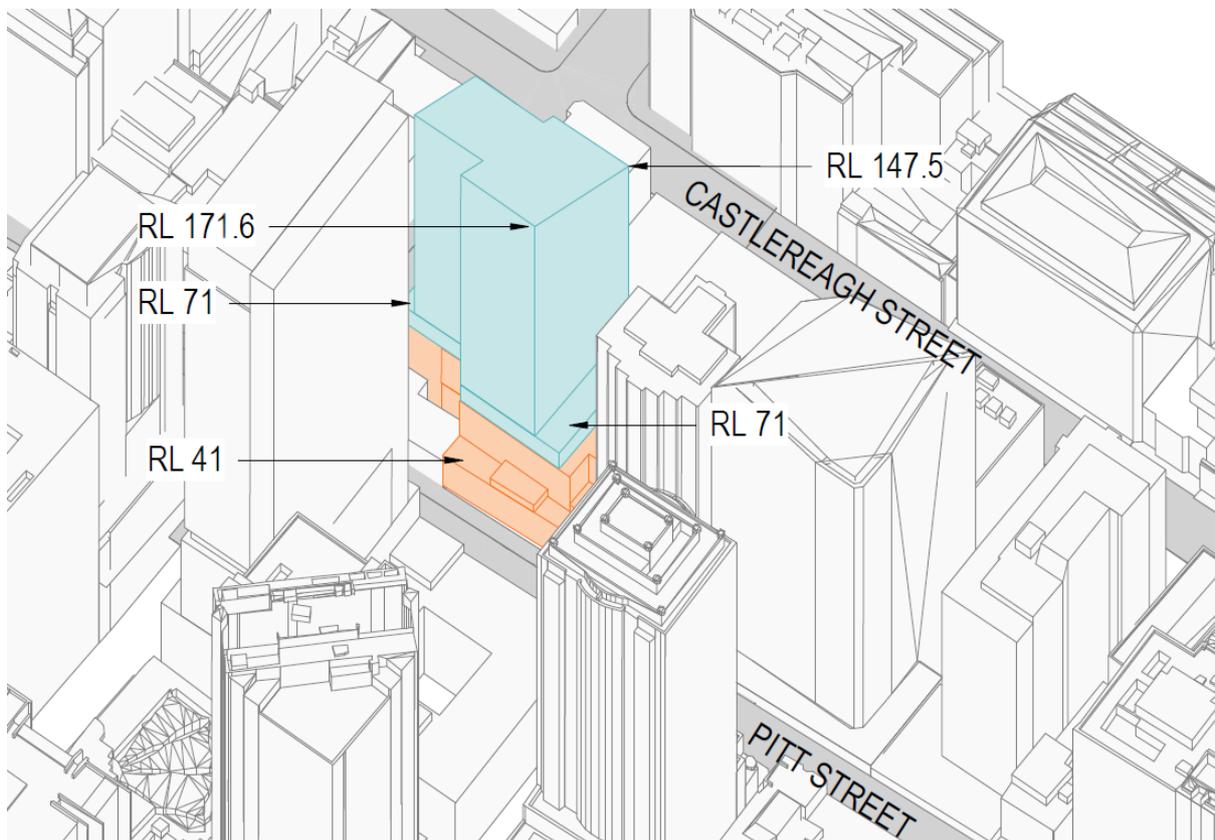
Exhibited proposed building envelope (axonometric diagram viewed from the south-west)
